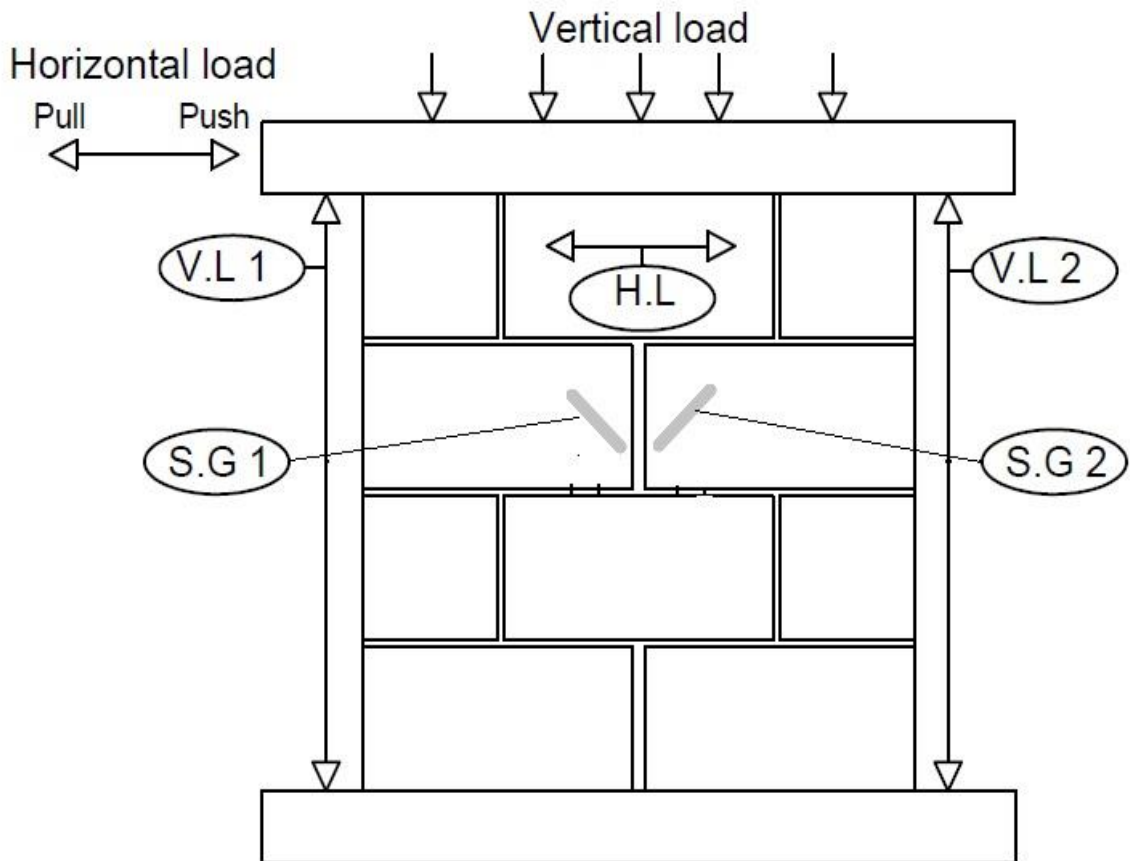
URM Wall Cyclic Test Instrumentation Setup
